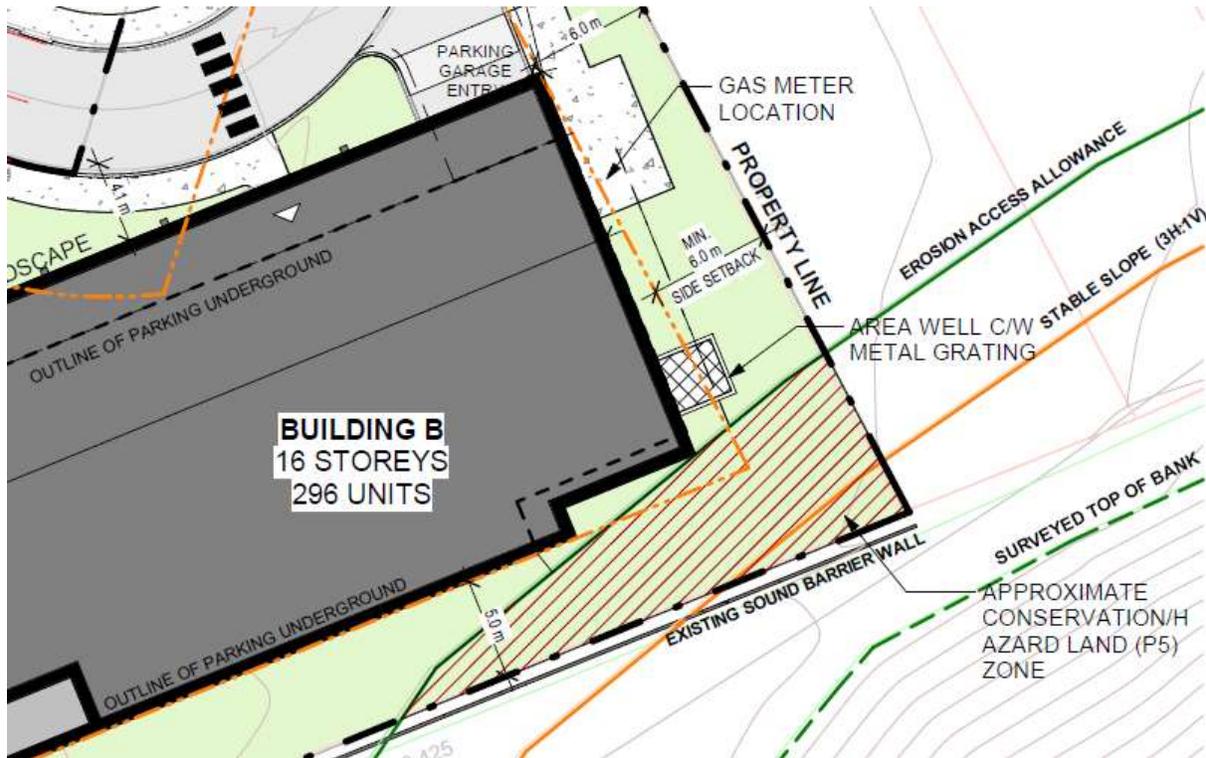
Southeast corner of site showing Erosion Access Allowance and Stable Slope limits
